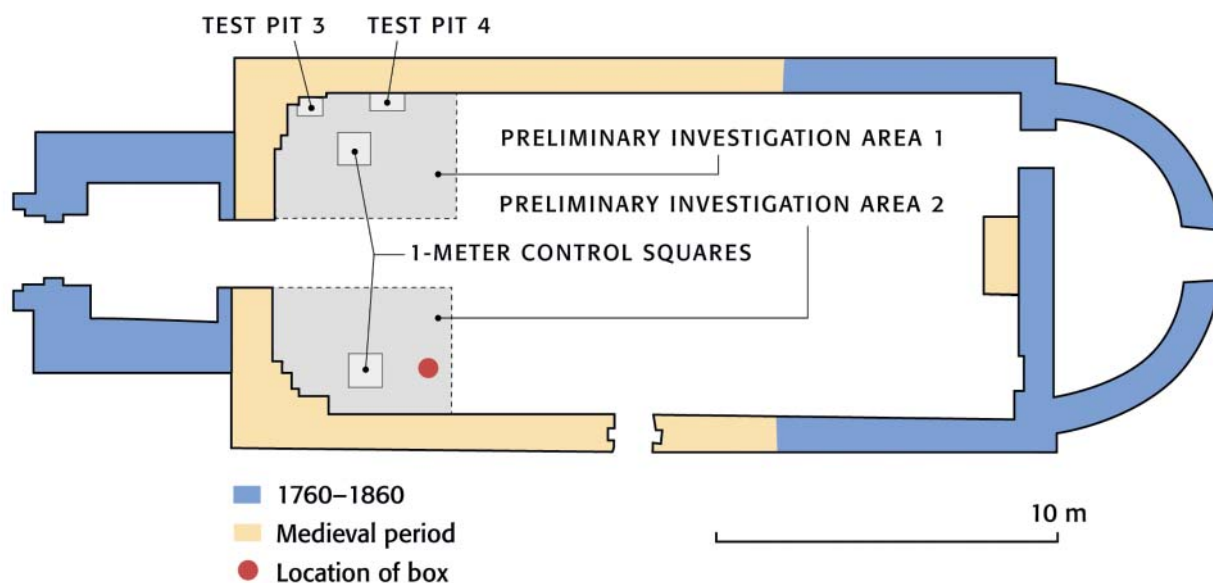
Architectural plan of Gällared Parish Church, Sweden illustrating the remains of the medieval local graystone rectangular long-house, its rebuilding (1831) and bell tower addition (1856). The 2015 archaeological investigation and location of the coffin containing the foetus found underneath the floorboards are noted (Image: Uno Andersson, Kulturmiljö Halland)
